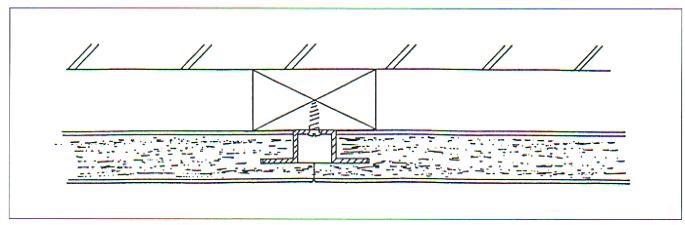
Omega profile, with tongue and groove set into the joint edge and screw-fixed to the substructure; tight joint
